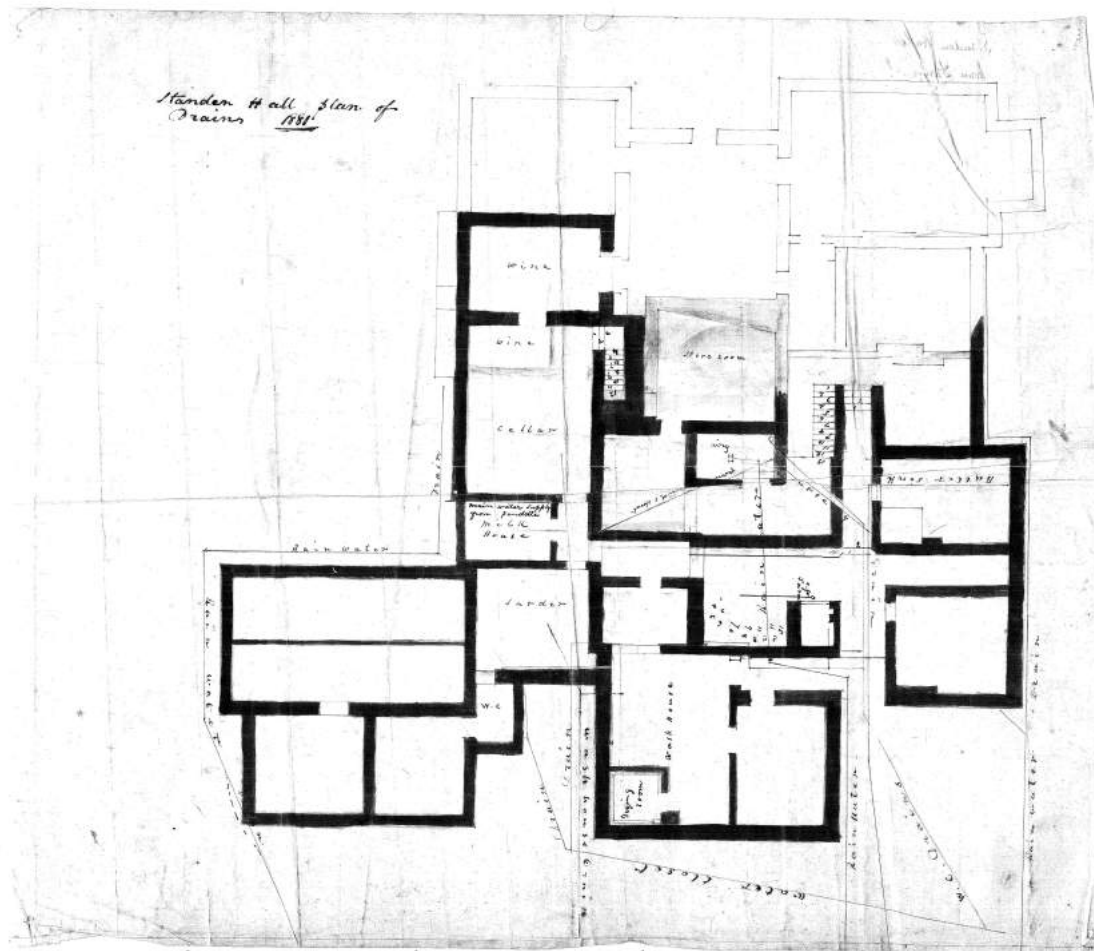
1881 drainage plan showing Standen Hall on existing footprint
